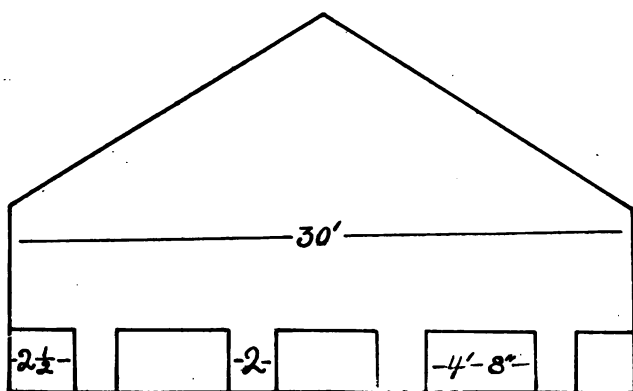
Another arrangement of benches in a 30-foot house. By this arrangement 73 1-3 per cent of the floor space is available for growing crops
